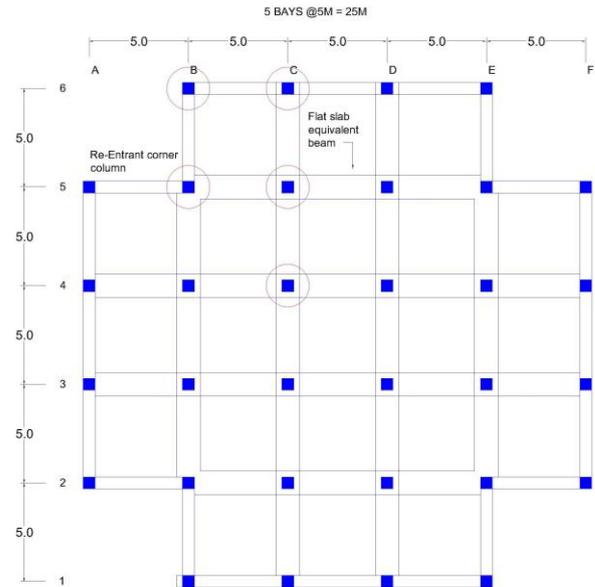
plan view of studied horizontal irregularity Re-entrant building as case no 2.
